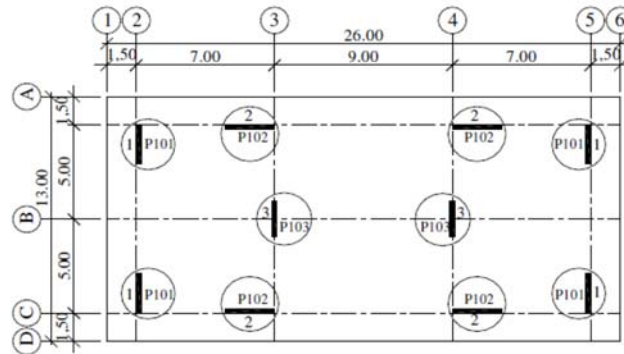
Floor plan of a 13-floored beamless structure sample.
